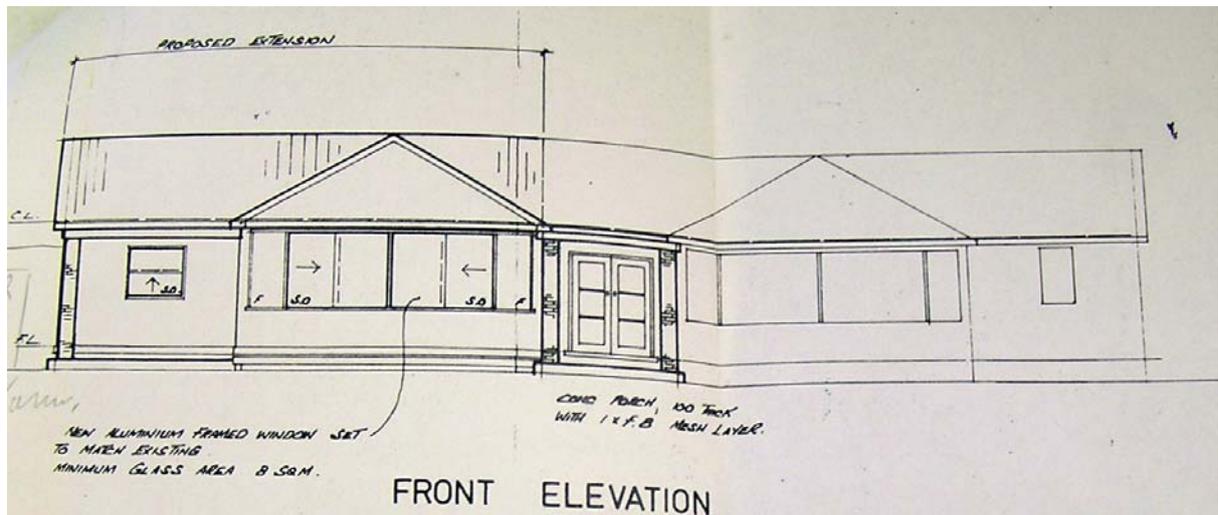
Front (east) elevation drawing of proposed addition to the Ballan Bowling Clubhouse, 1980.
